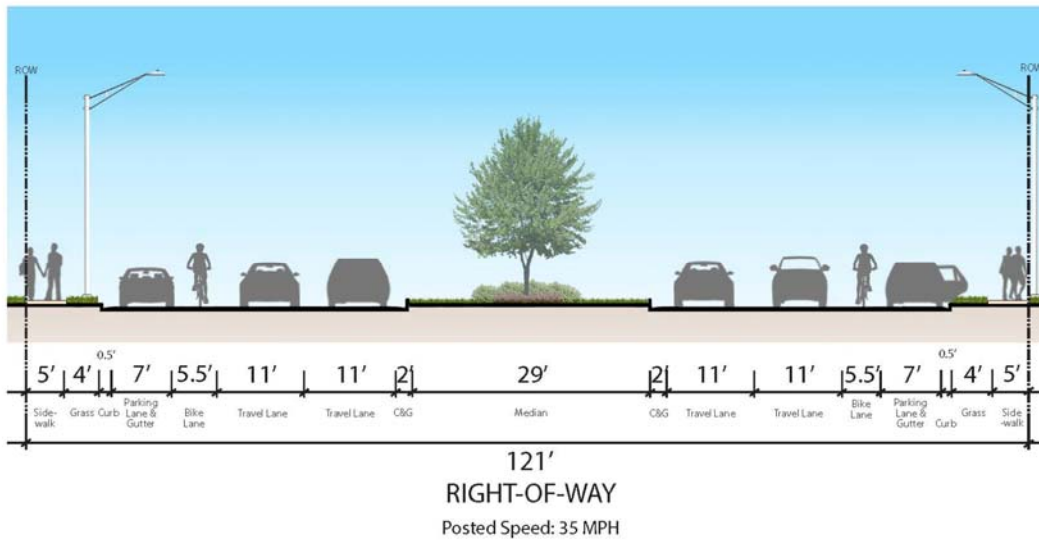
Segment 4 Existing Typical Section (Cassady St to Bulldog Ln)
